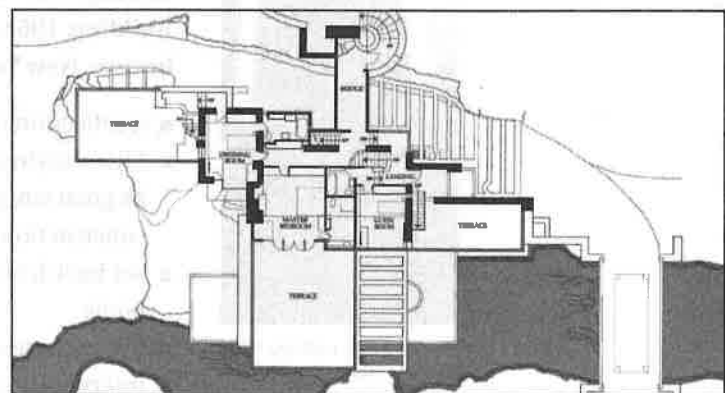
Frank Lloyd Wright, Kaufmann House, “Fallingwater,” plan
